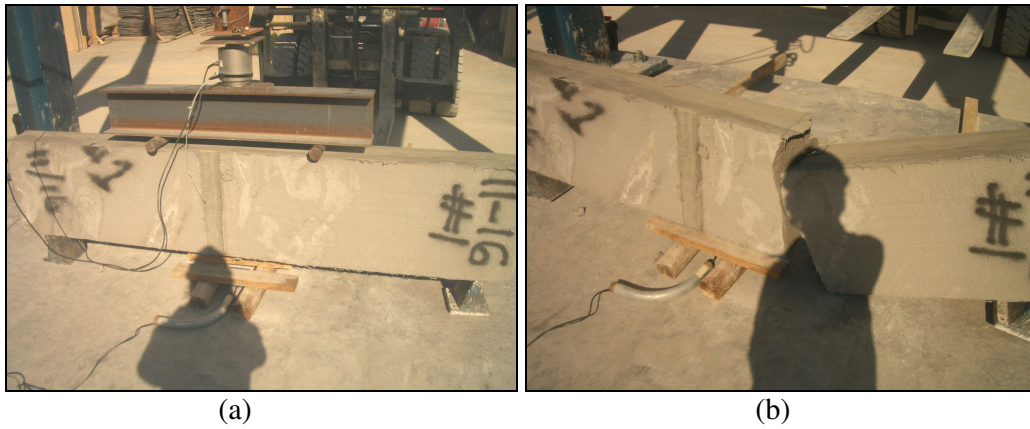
Beam for 1<sup>st</sup> batch concrete cast on 11/16/06 for 3 day test;
